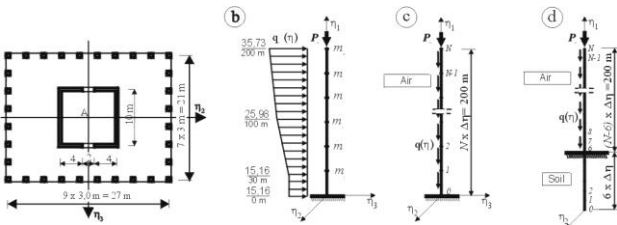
Cross-section and schemes of a tall building modelled as thin-walled cantilever with two closed rectangular tubes.
